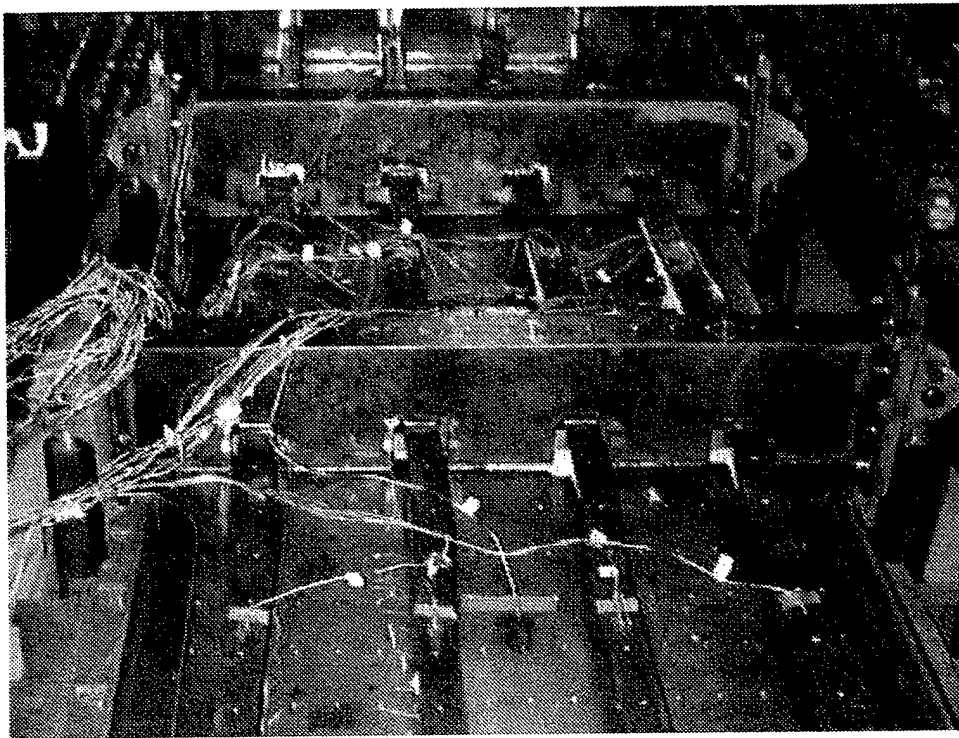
Grillage 0894 in Test Fixture after Collapse - Top View
